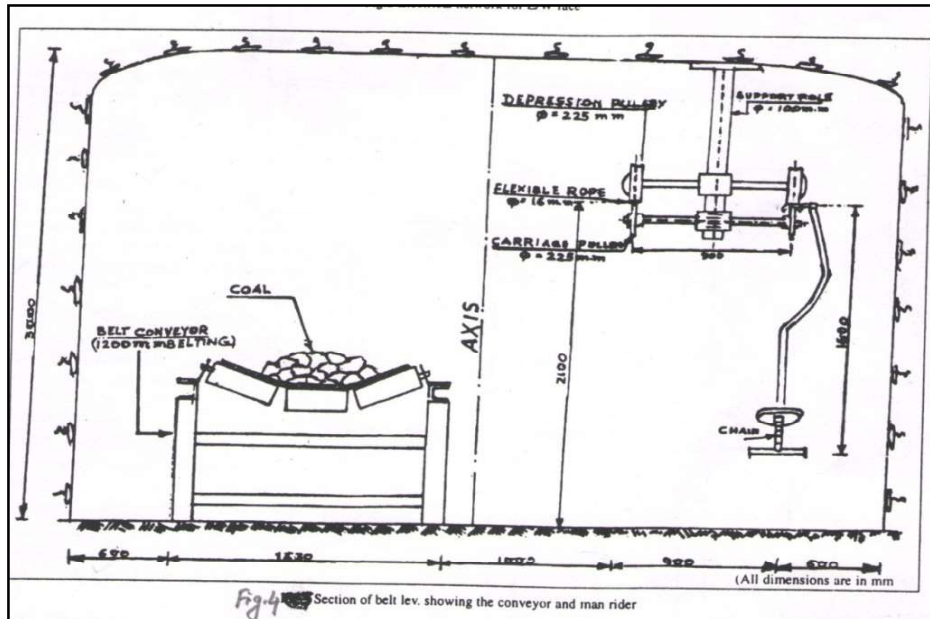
Section of belt level showing the conveyor and man rider at Kottadih
